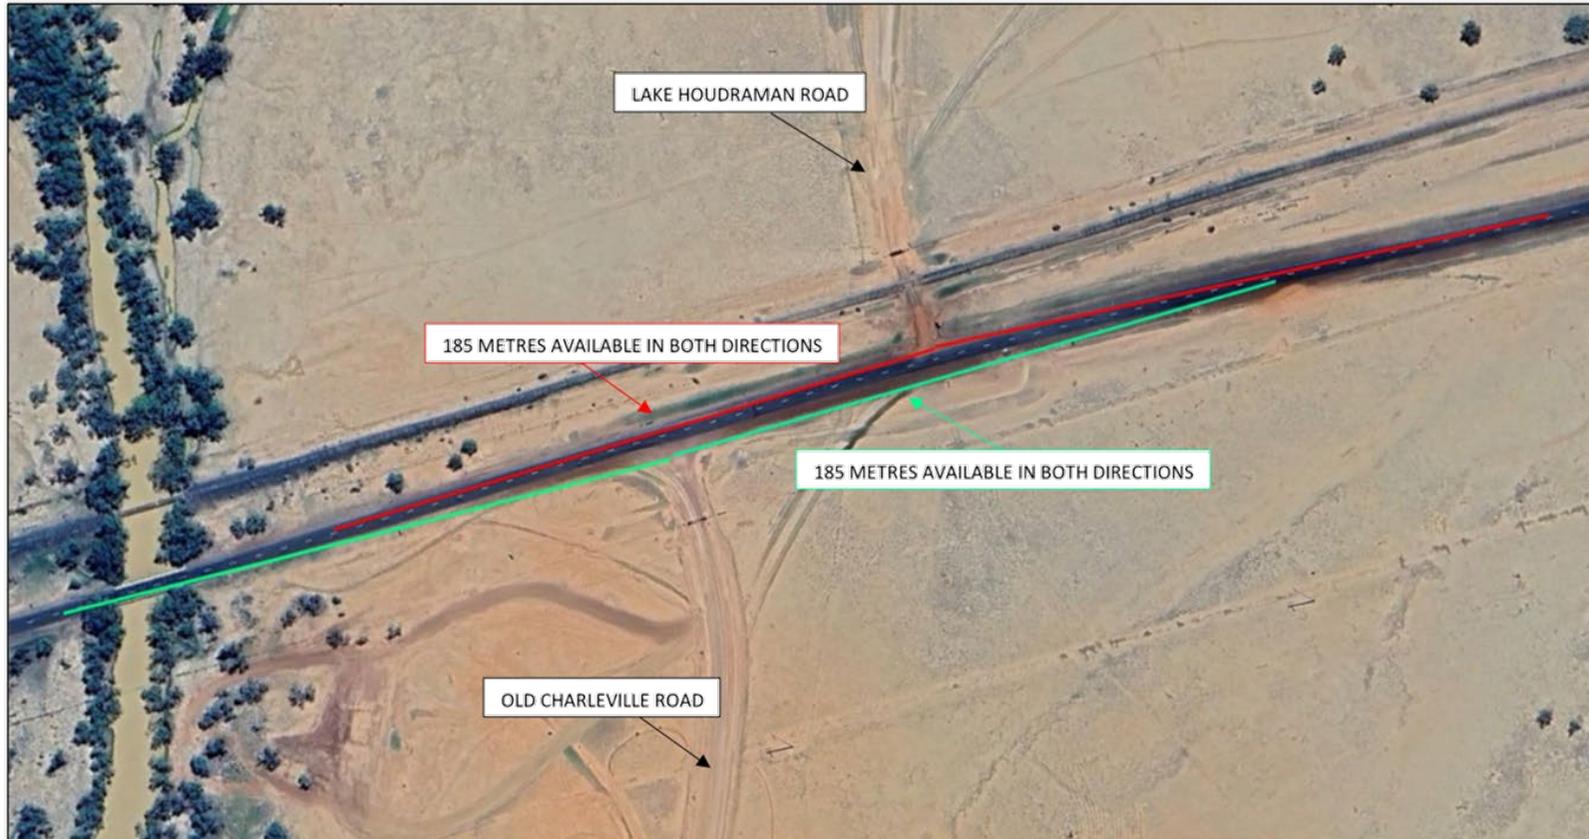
AVAILABLE SIGHT DISTANCE AT THE LAKE HOUDRAMAN ROAD AND OLD CHARLEVILLE ROAD INTERSECTIONS
